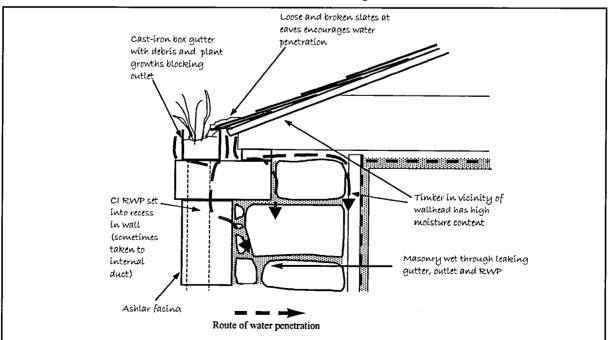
Detail at eaves using a box gutter set on the wallhead. This arrangement allows ready access of water into the wall should the gutter become broken or blocked. The situation is often exacerbated by loose or broken slates which allow access of water to the wall plate and beam ends (in the first instance)
